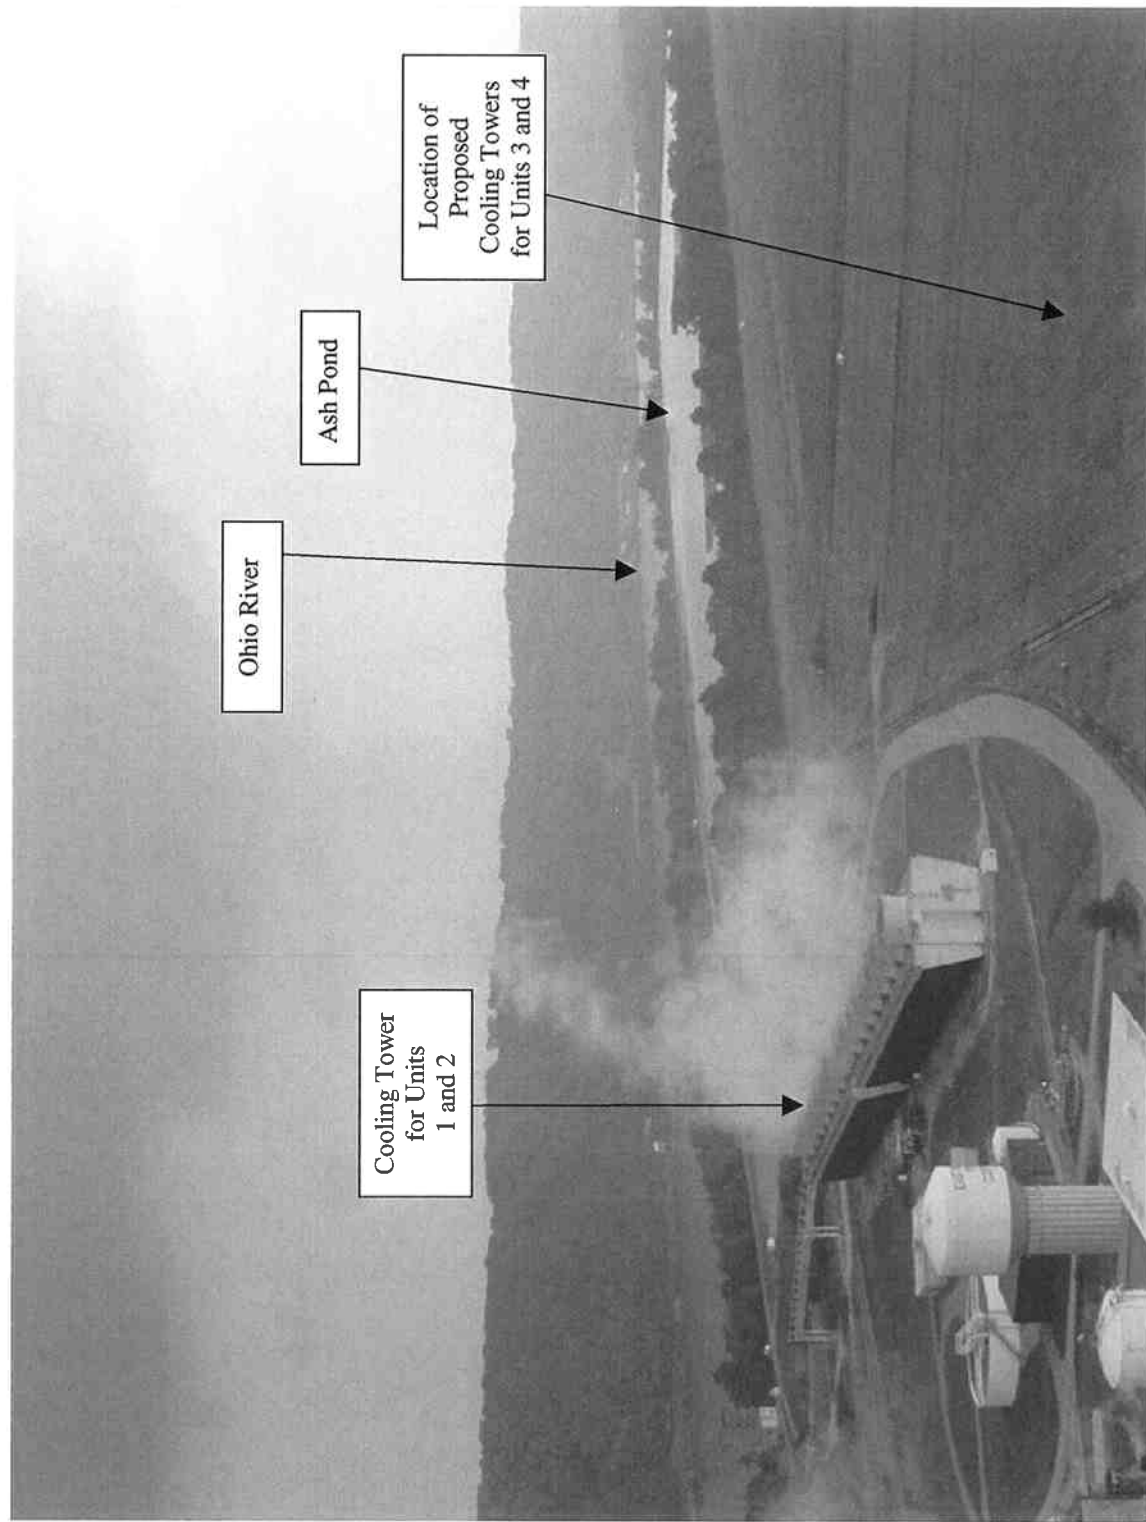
Facing Northeast. From Top of Building Units 1 and 2: Cooling Towers for Units 1 and 2 on Left; Proposed Site for Cooling Towers for Units 3 and 4 on Right.
